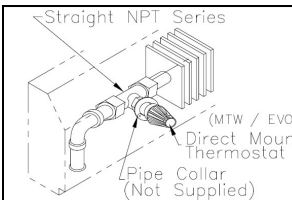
Typical Installation of Direct Mount Thermostatic Head in Baseboard
